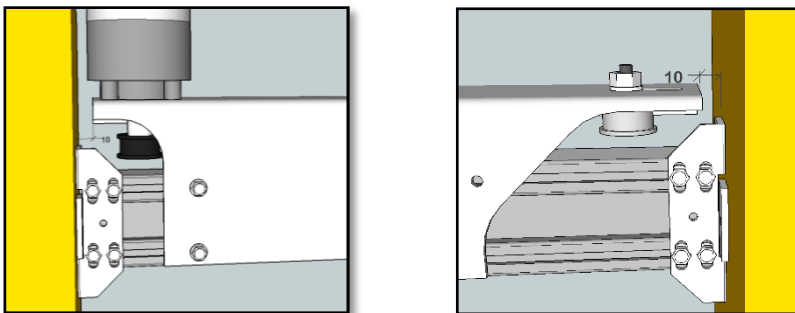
Angles mounted on the rail with distance to each pilaster.
